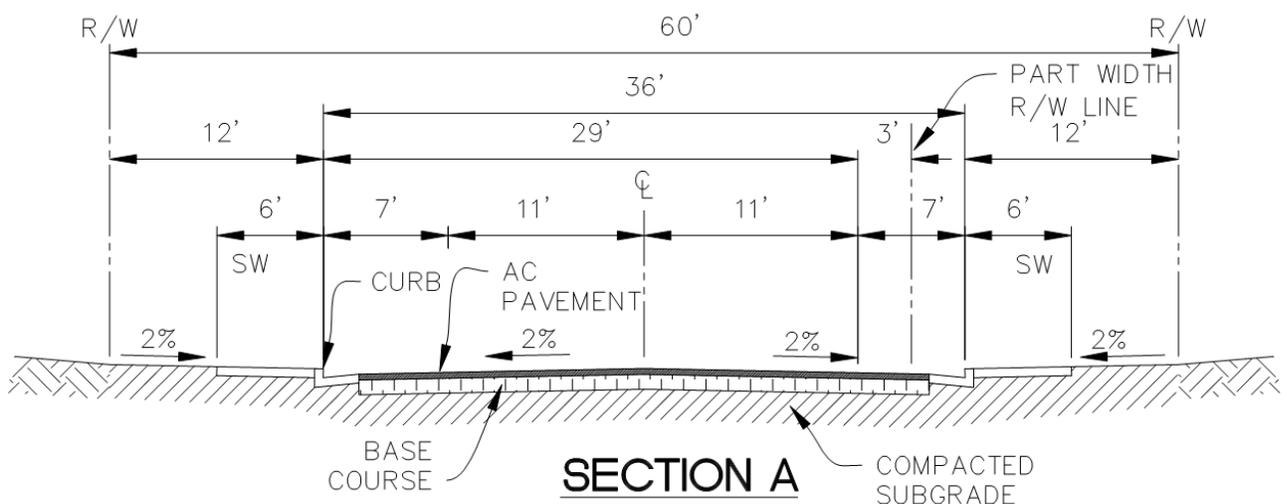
LEMON STREET (Modified Std. 105)
